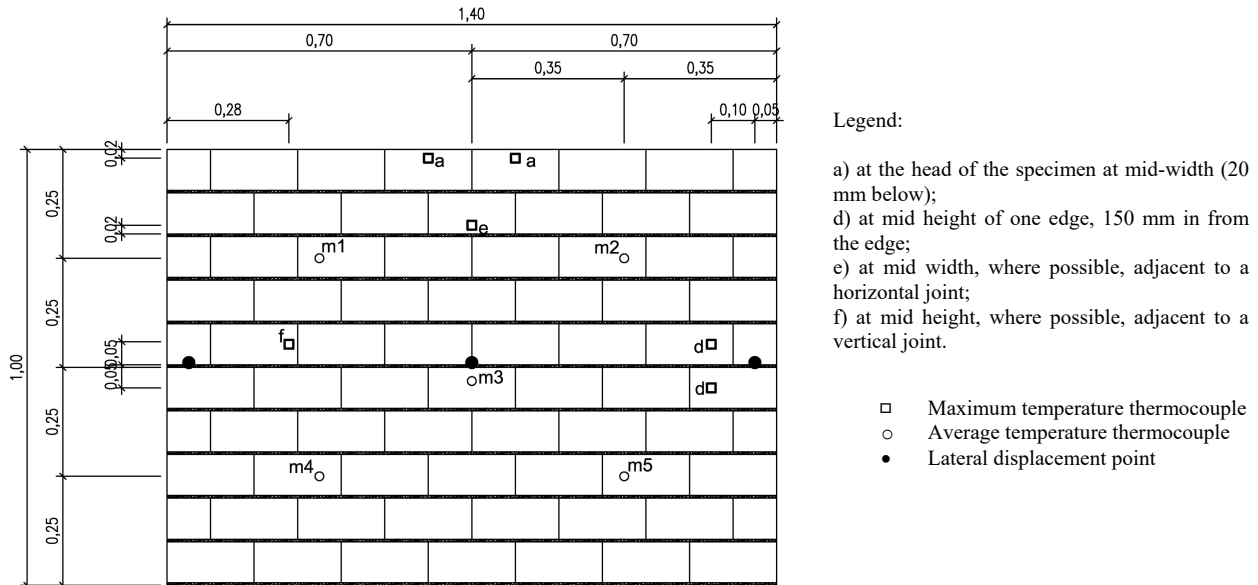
Specimen dimensions and positioning of thermocouples and lateral displacement transducers
